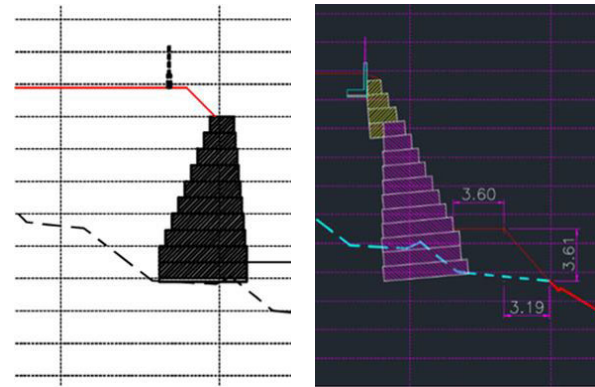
Gabion wall from the original design (left) and gabion wall as executed (expected) (right).
